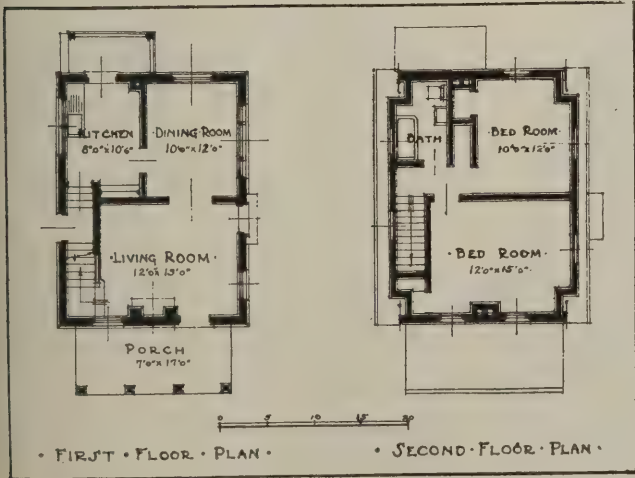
Floor plan of the five-room Paruco Park dwelling shown in Fig. 1, a most compact and convenient arrangement. The rooms are of ample size and provided with plenty of sunlight
